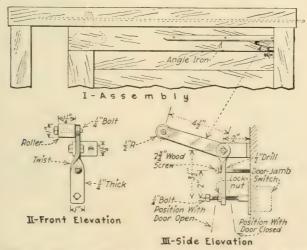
A.—Method of installing a door-bolt switch which is to be operated by a sliding door. (Lamps within the storeroom are lighted when the roller runs off of the angle iron as the door is opened. The lamps will be extinguished when the door is closed, even though it is not closed tightly. In some construction it may be necessary to provide a channel or groove in the wall for the angle iron.)
